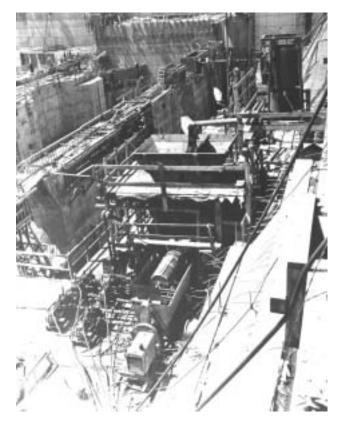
Mixing and pumping plant at Bull Shoals Dam. Grout materials were dry-batched into 4 yd³ (3 m³) concrete buckets at the conventional concrete plant for transfer to this mixing plant located at the rear of the powerhouse substructure. Water batcher is above and to the right. Note rotary ground screen and agitator (in lower foreground) from which the battery of four pumps draws the grout.
